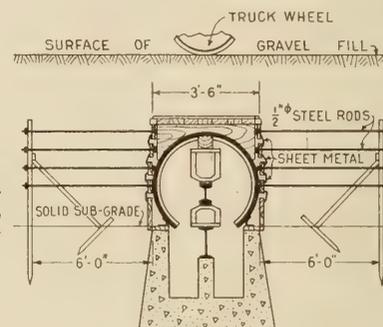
SHOWING APPARATUS INSTALLED TO PREVENT FRICTION BETWEEN GRAVEL FILL AND SIDES OF CULVERT
